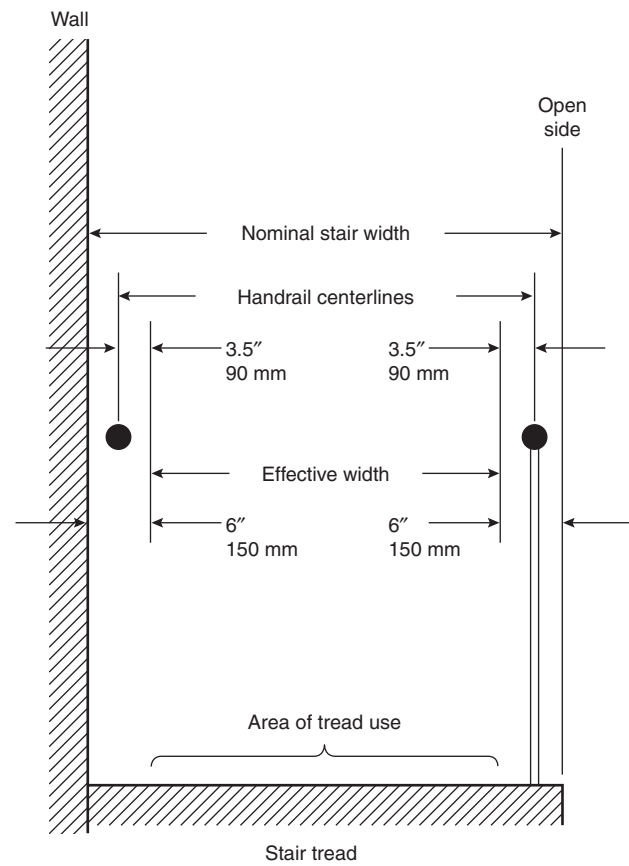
Measurement of effective stair width in relation to walls and handrails.
